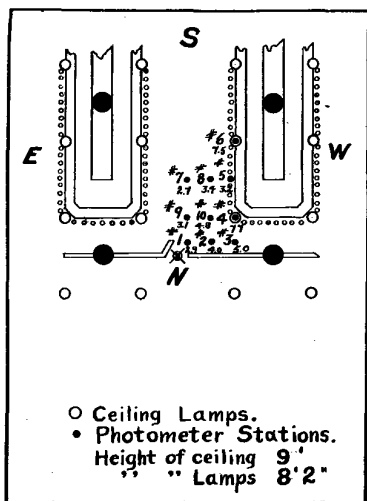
Section plan of basement mezzanine, (dairy lunch), showing location of furniture, pillars, lighting units, test stations and illumination data.
